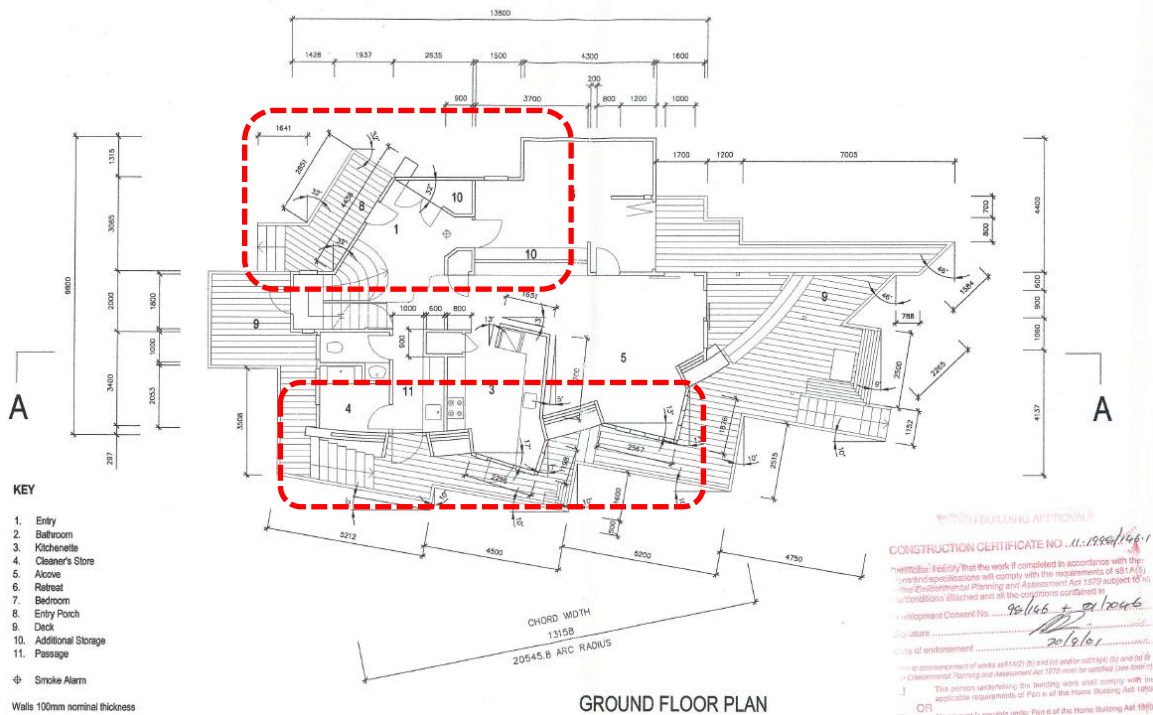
Extract from "Type B" ground floor CC stamped plans (11.1998.146.1)
